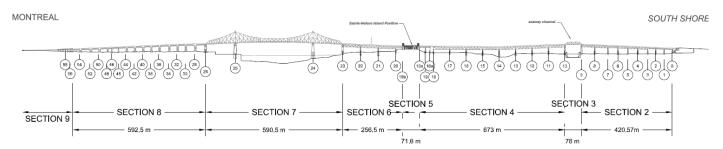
Spans upstream elevation of Jacques Cartier Bridge – Sections 1 to 8
